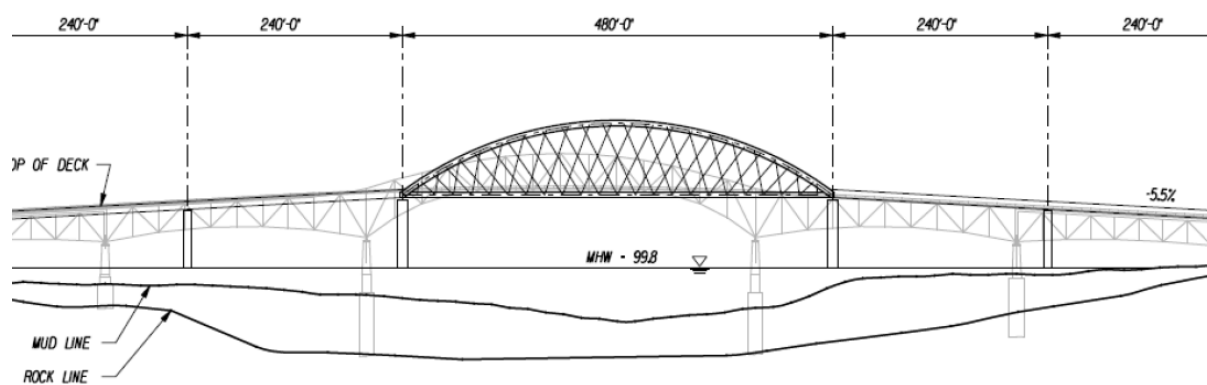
Alternate Network Arch Bridge Design Concept of Lake Champlain Bridge Project of USA [37]
